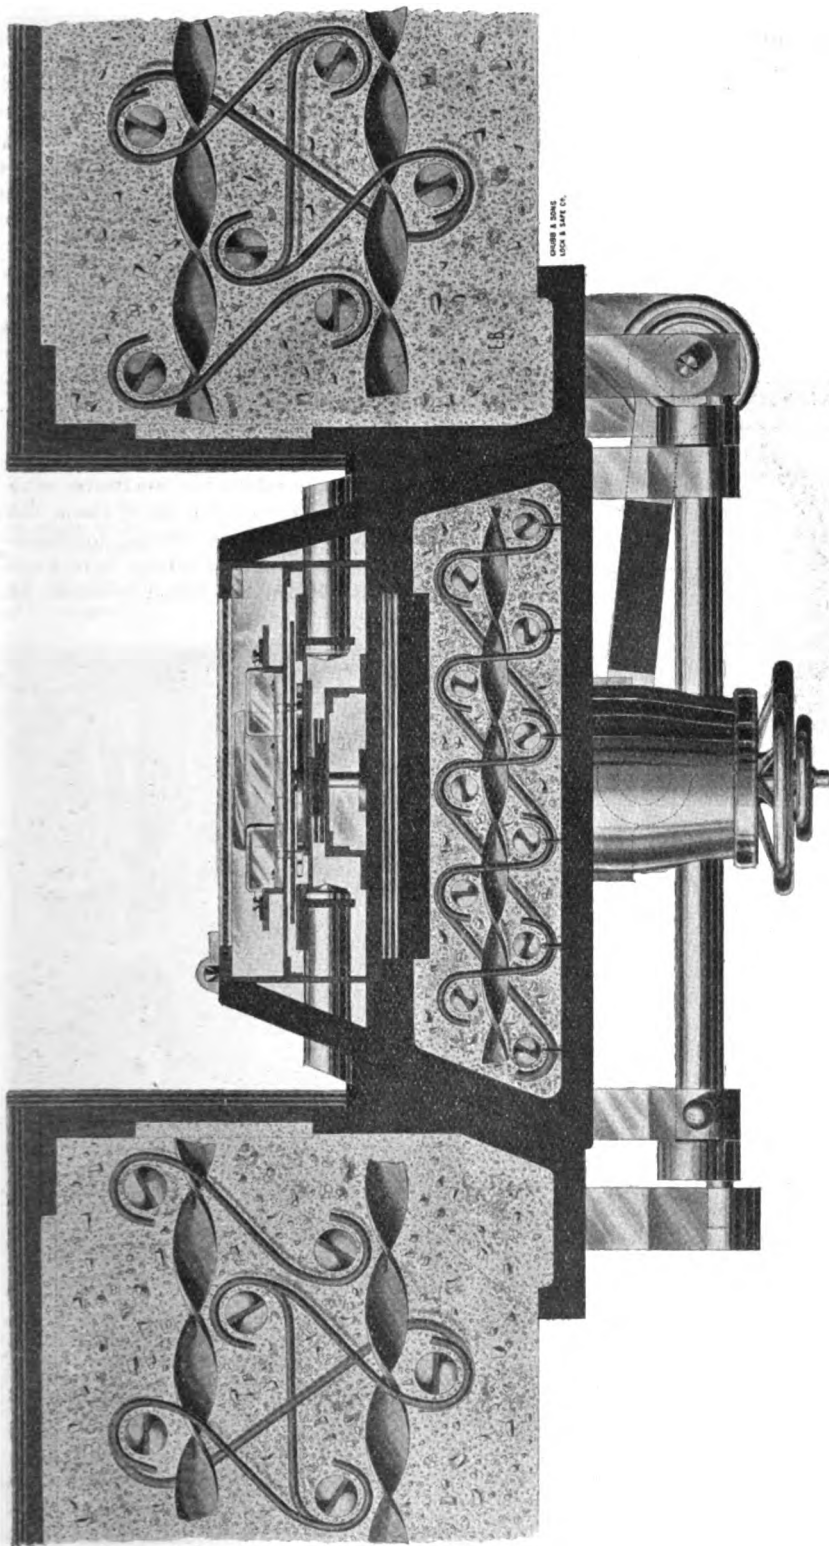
Horizontal Cross Section. Chubb Mark VI. Treasury Door (Cast Manganese Steel), clear opening 7 ft. high x 3 ft. wide. Details of the irregular arming of the Strong Room walls are shown either side of the door section.
